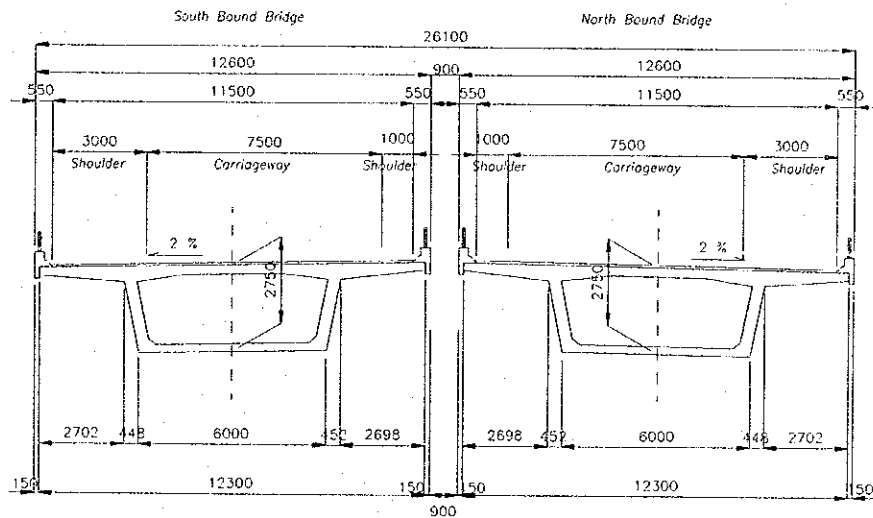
Typical Cross-section of PC Box Girder Bridge (simple span & 2-span continuous)
